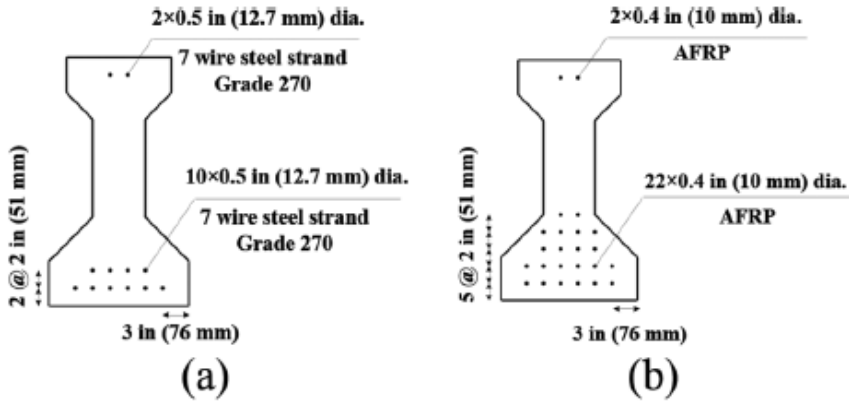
Prestressing layouts of Type-1 girder (a) is prestressing steel and (b) is prestressed AFRP (Gar 2013)
